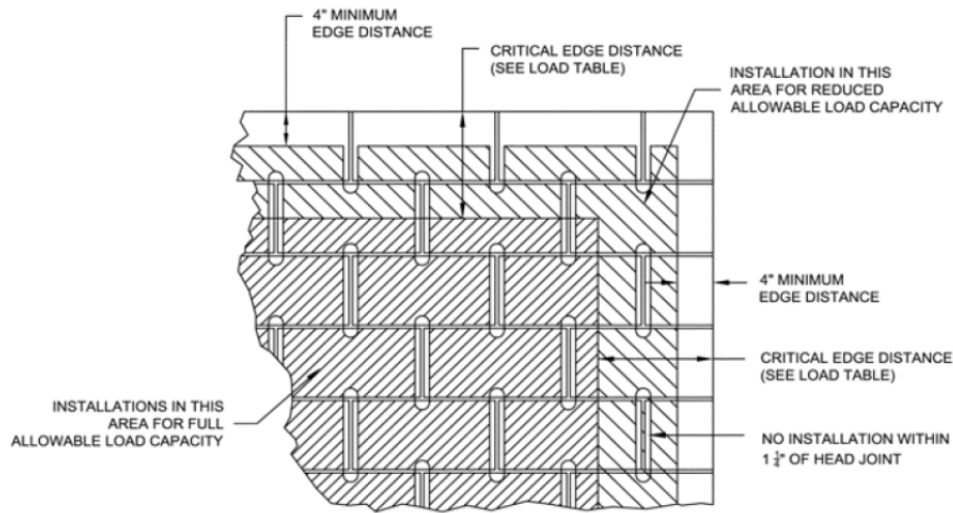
TITEN HD SCREW ANCHOR INSTALLED IN THE FACE OF GROUT-FILLED CMU (CONCRETE MASONRY UNIT) WALL CONSTRUCTION (Refer to Tables 1, 2, and 3)
